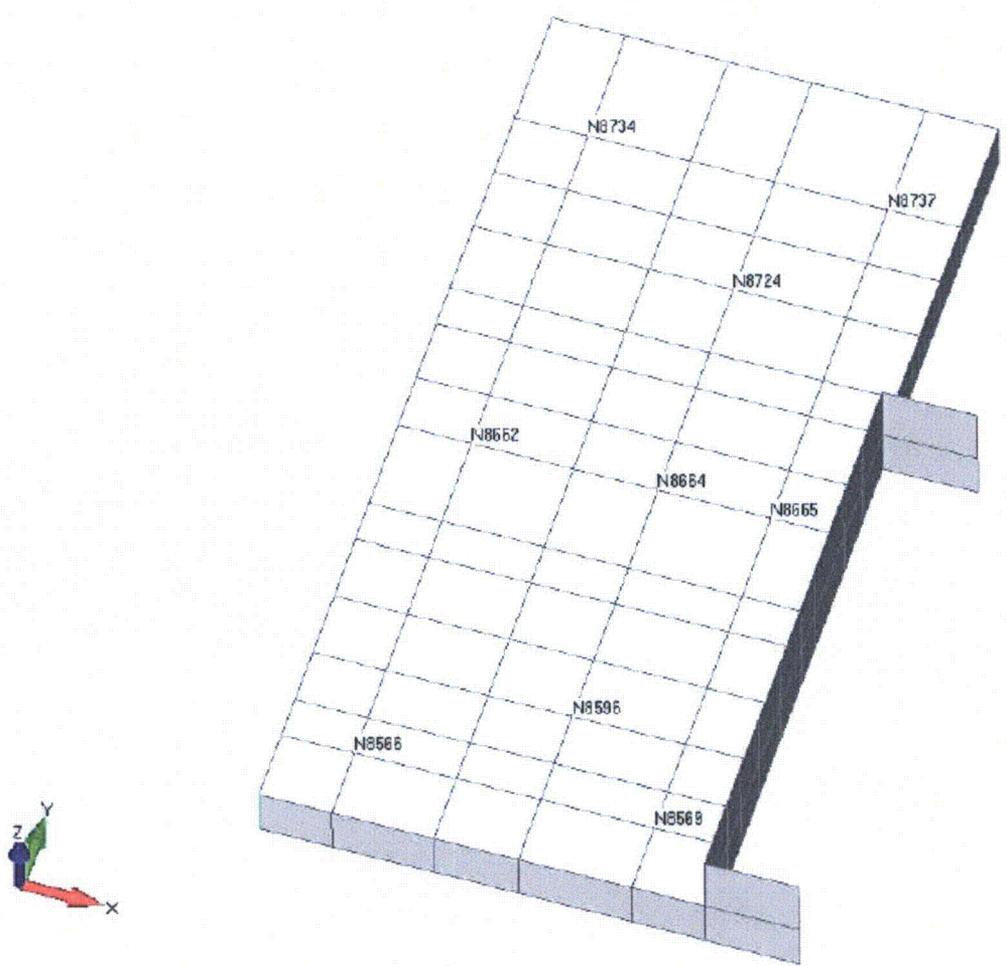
Nodes used for UHSRS Pump Room, Roof Slab ISRS (Relates to Figures 3KK-3, 7-9)
